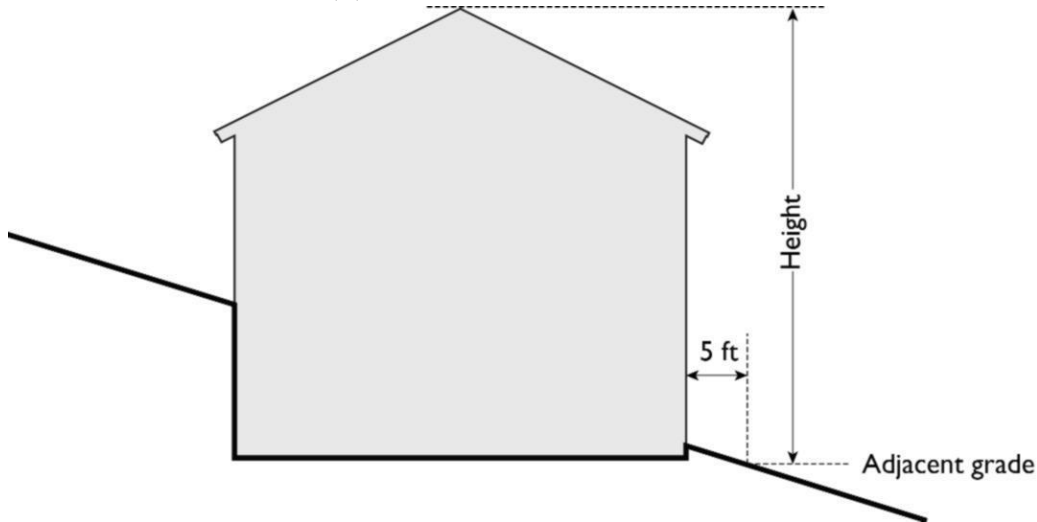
A: MEASURING BUILDING HEIGHT
